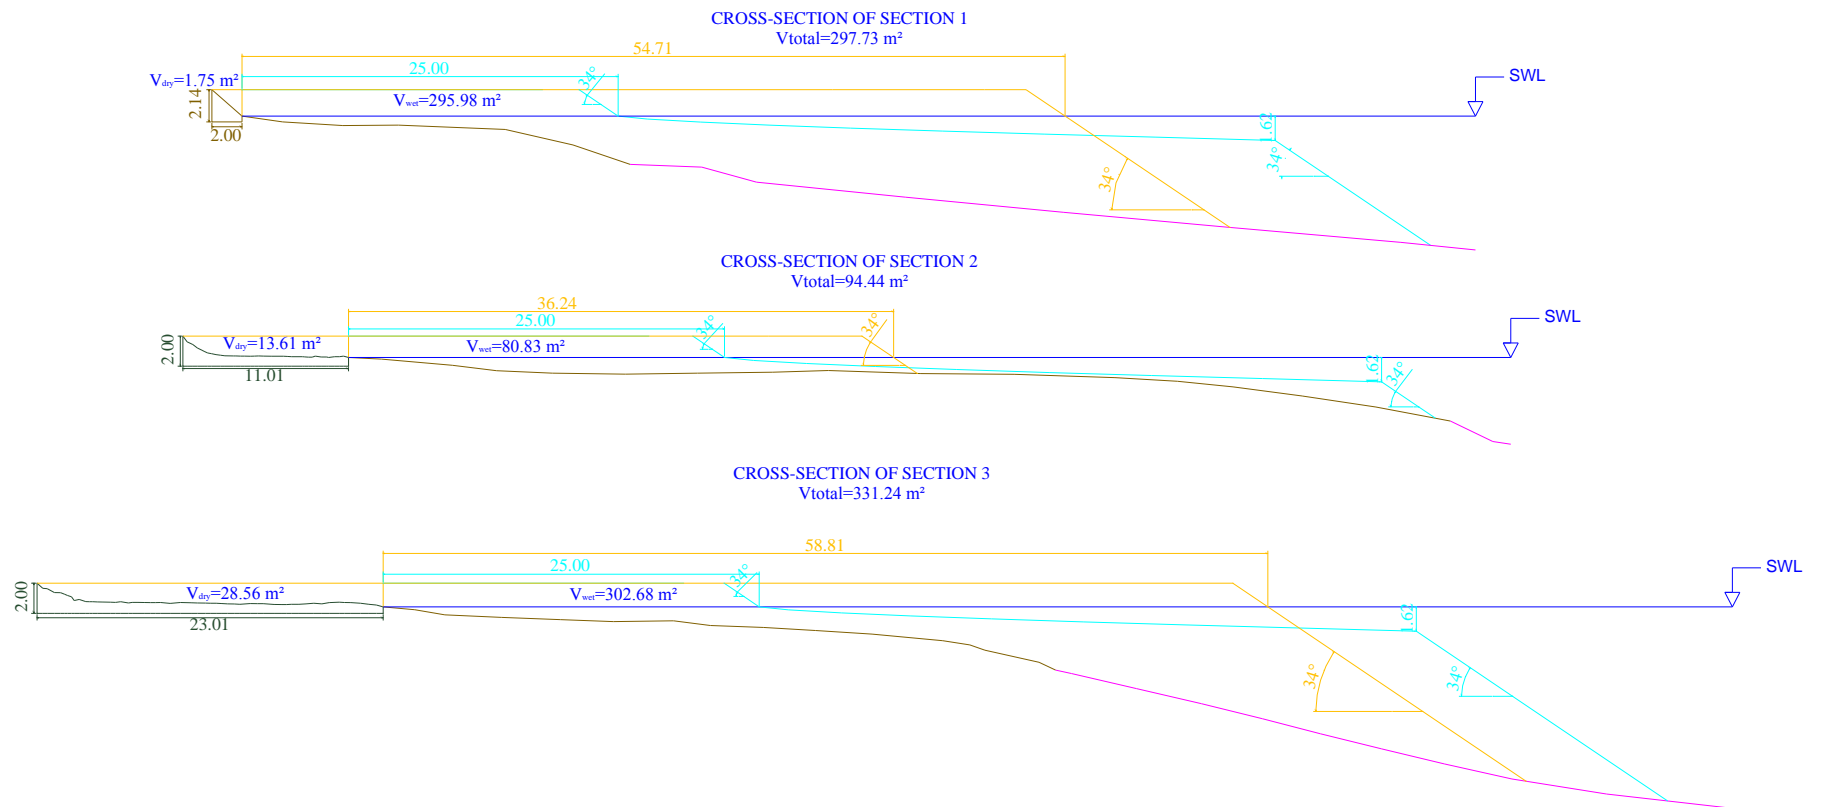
Design profiles of Section 1,2 and 3 for 25 m new dry beach width ($D_{fill}=0.32 \text{ mm}$).
